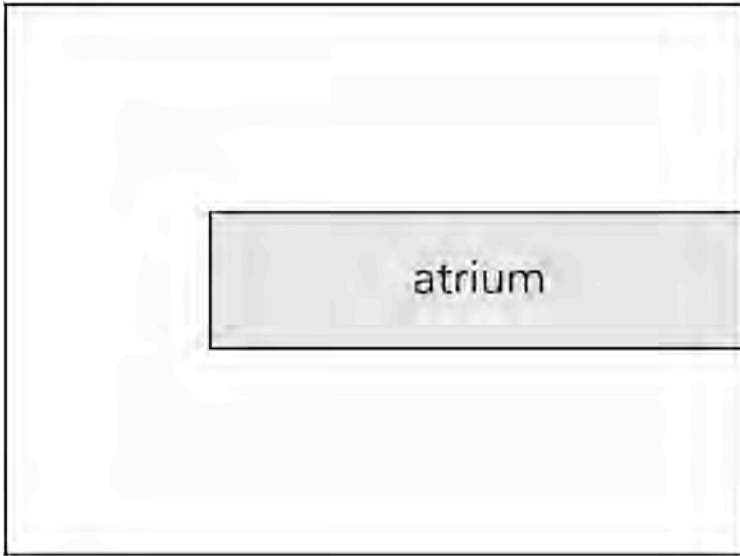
Building 550: Diagram of Peterson Laboratory's atrium space before the d.school renovation
